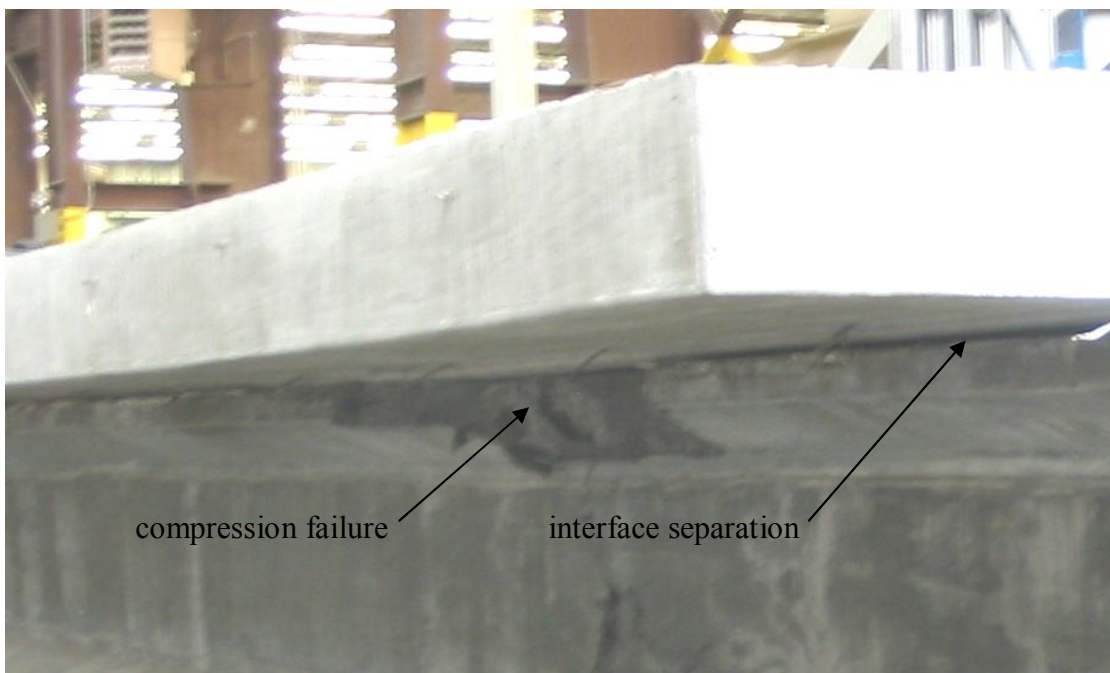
Top flange of girder 2 after shear test 2-1.
